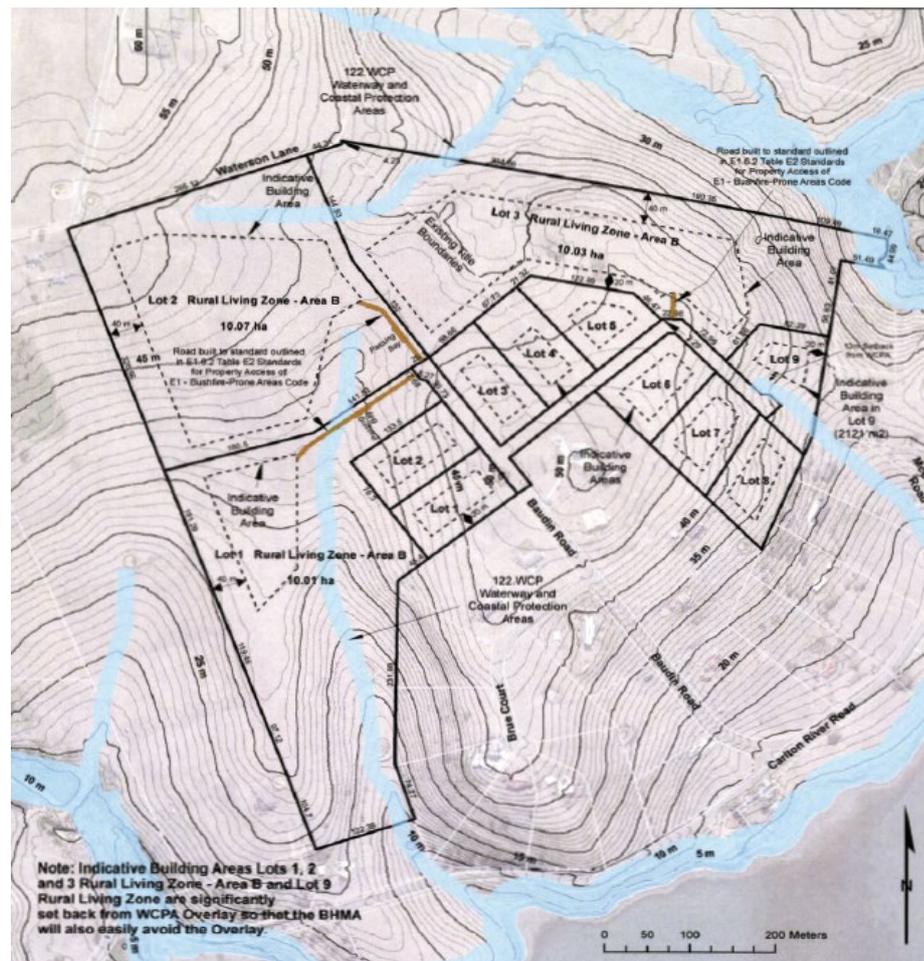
The proposed subdivision layout on the subject site. (source: Applicants supporting reports)
